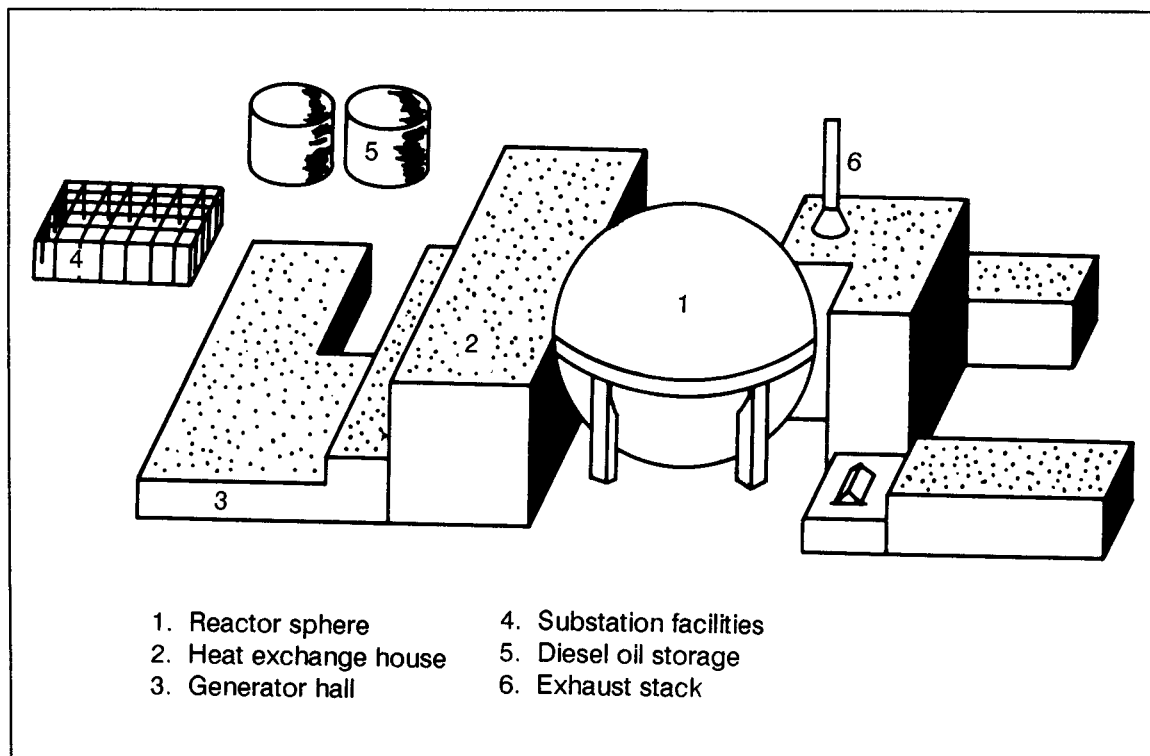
Example of construction/building type (thermal nuclear power plant)
